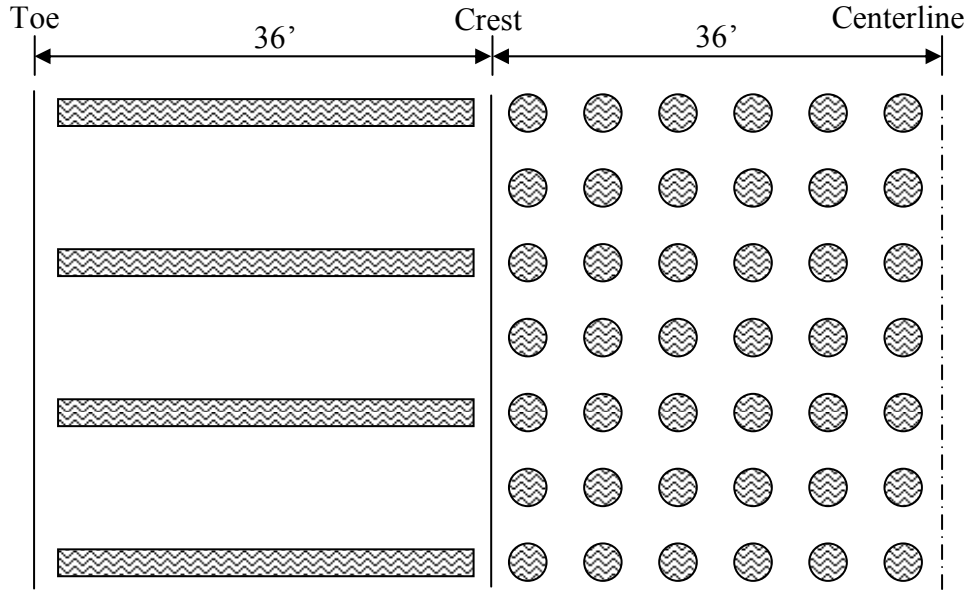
Plan view of the example embankment with continuous panels under side slopes
